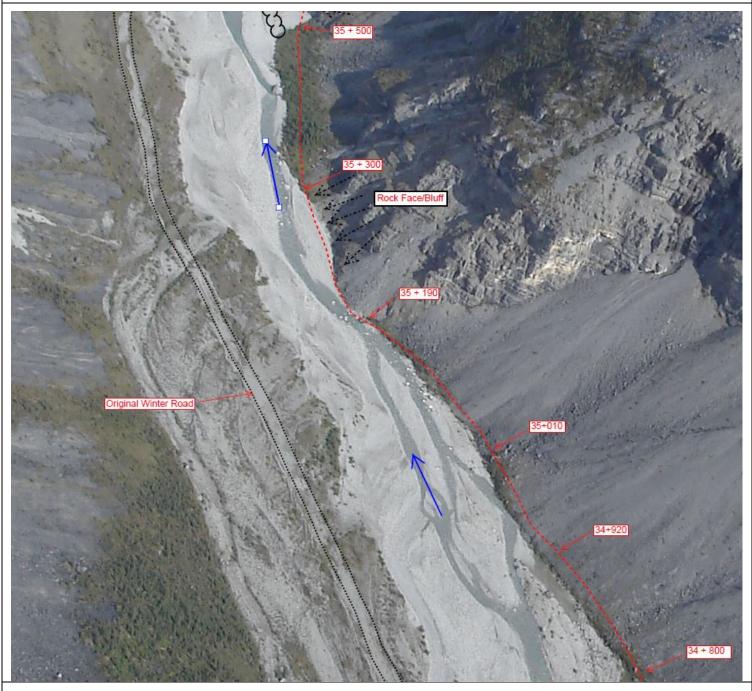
Aerial view looking north from KP 34+800 to 35 +500.
